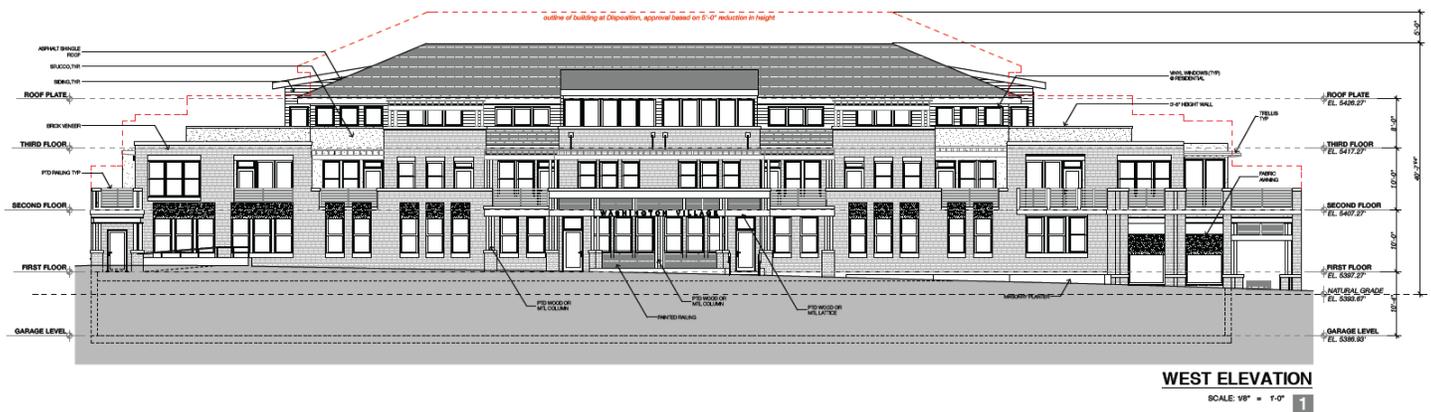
Approved Broadway Building design with overall height reduced by 5 feet.
